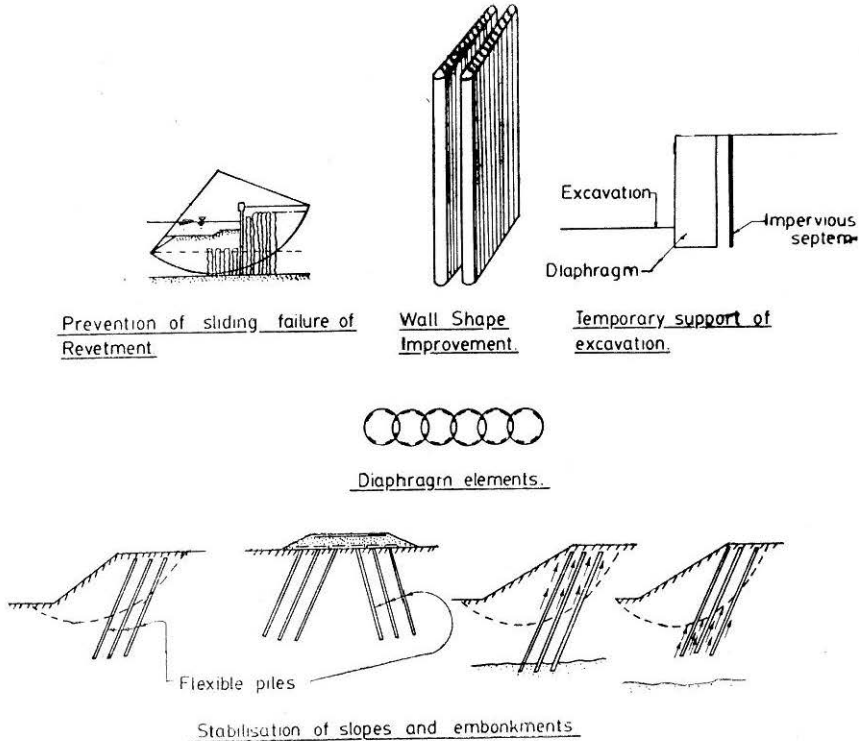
Applications of reinforced stabilised soil piles and elements
